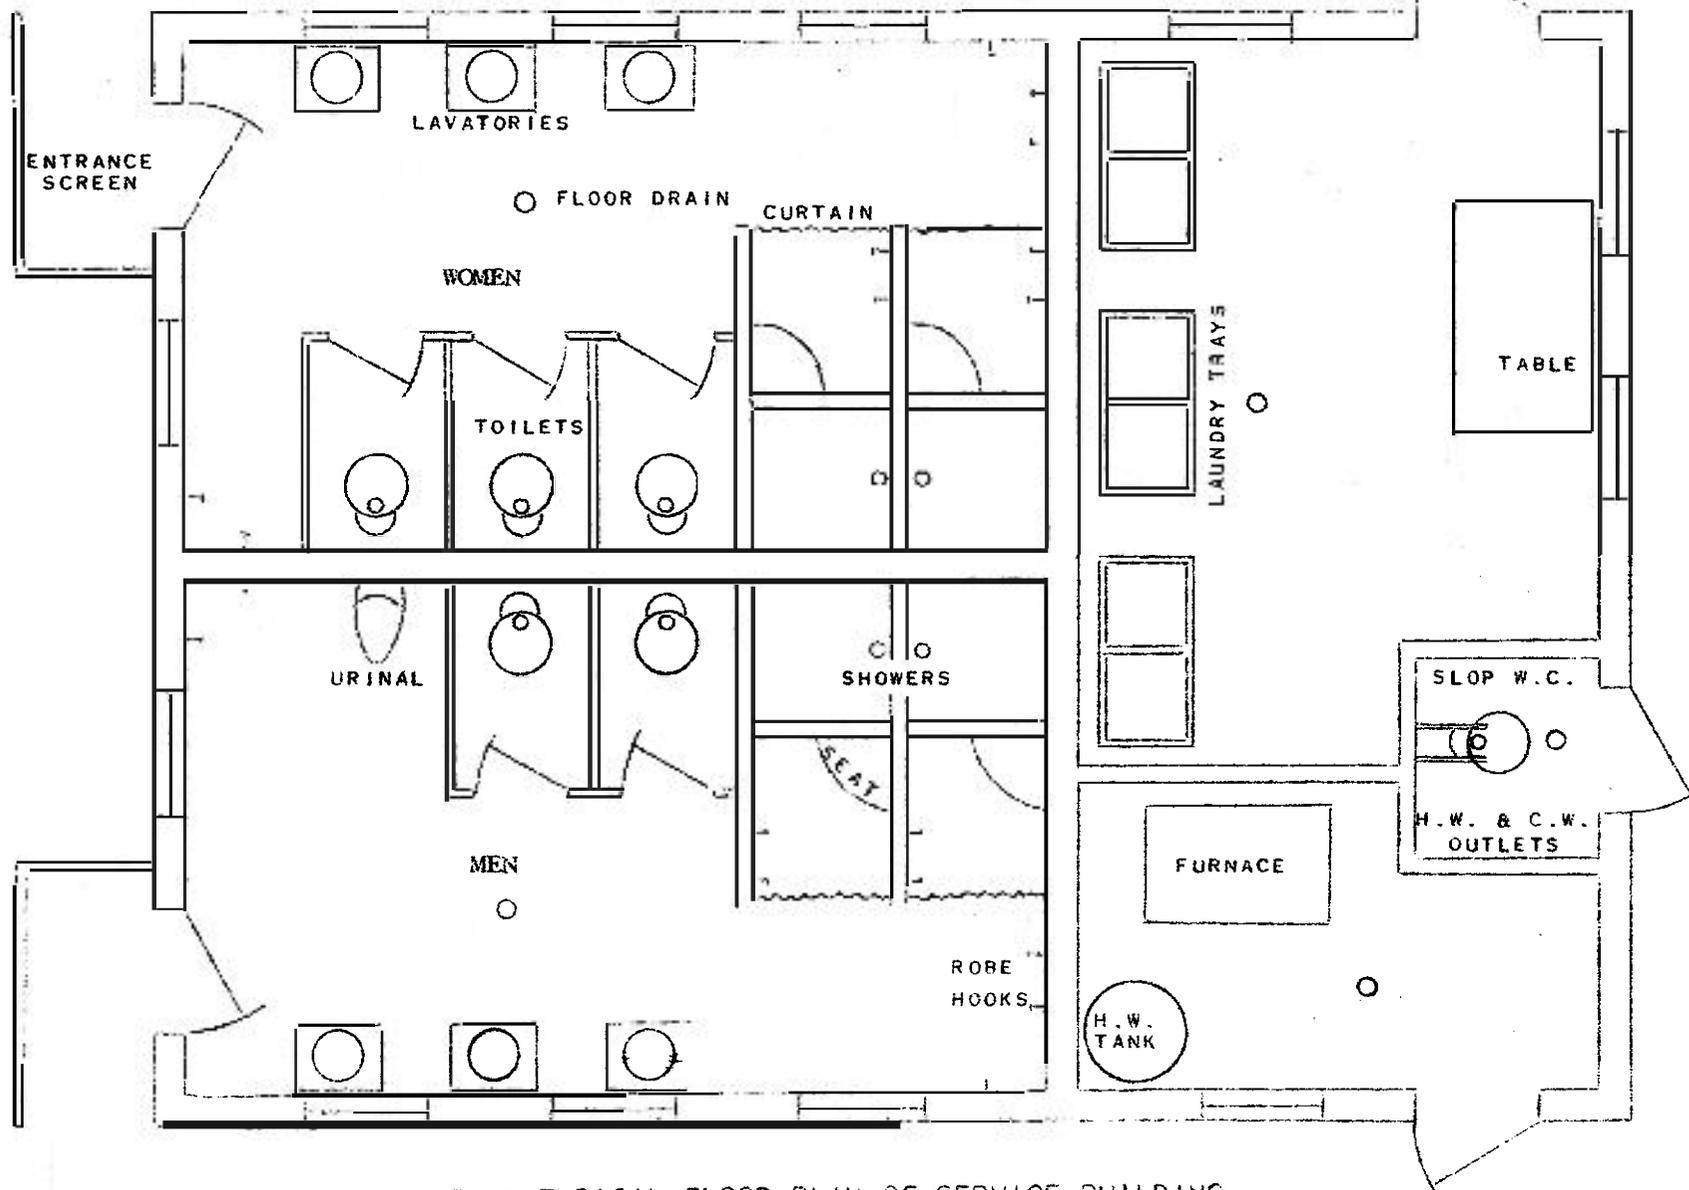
TYPICAL FLOOR PLAN OF SERVICE BUILDING
